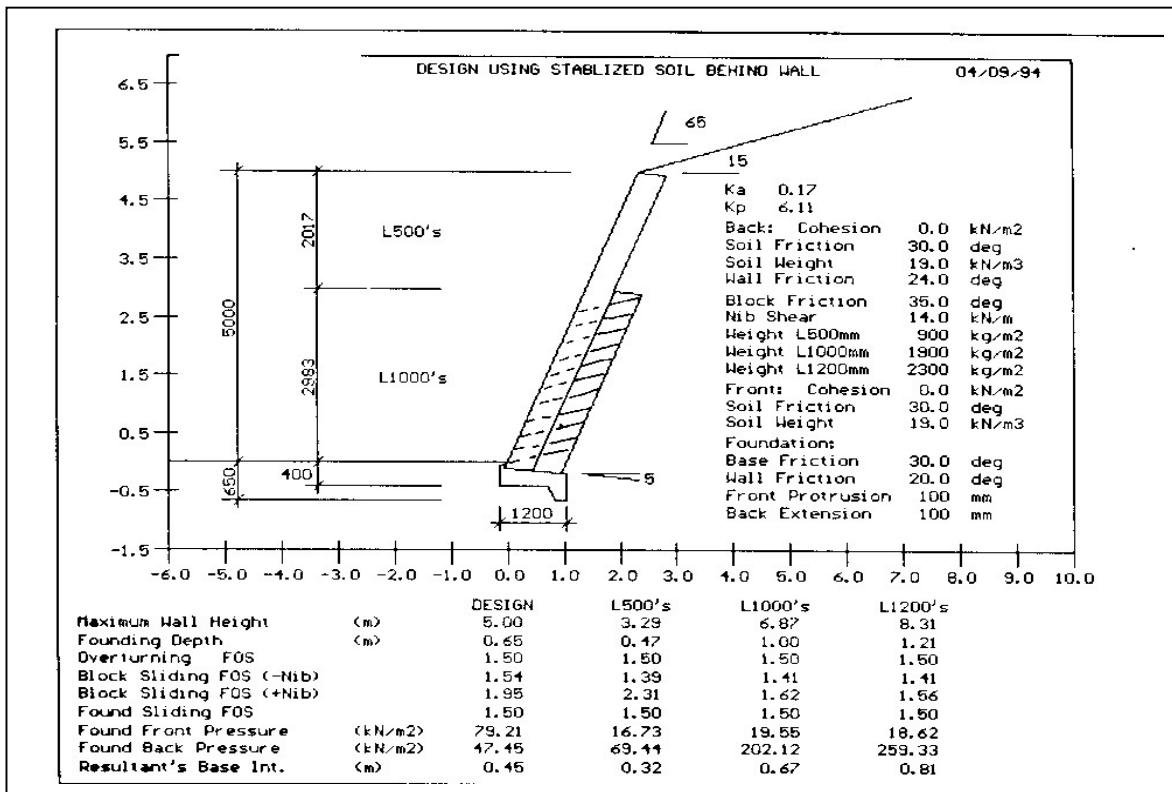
Example of a design in which the wall slope is kept at a steep angle, and a stabilized block of backfill is included in the design as part of the wall.
